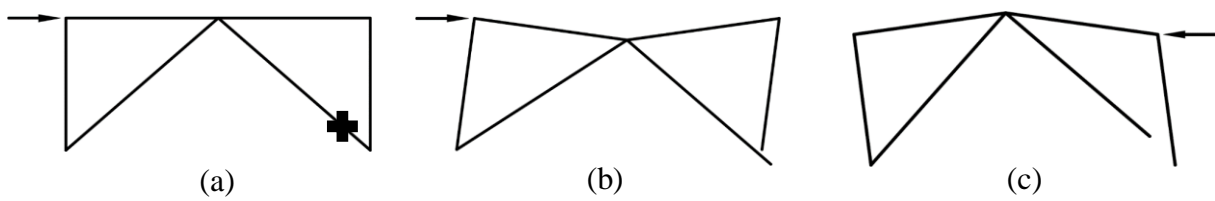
Chevron frame brace-gusset interface behavior: (a) weld fracture; (b) brace reengagement on gusset plate in compression; (c) brace detachment – no force transferred.
